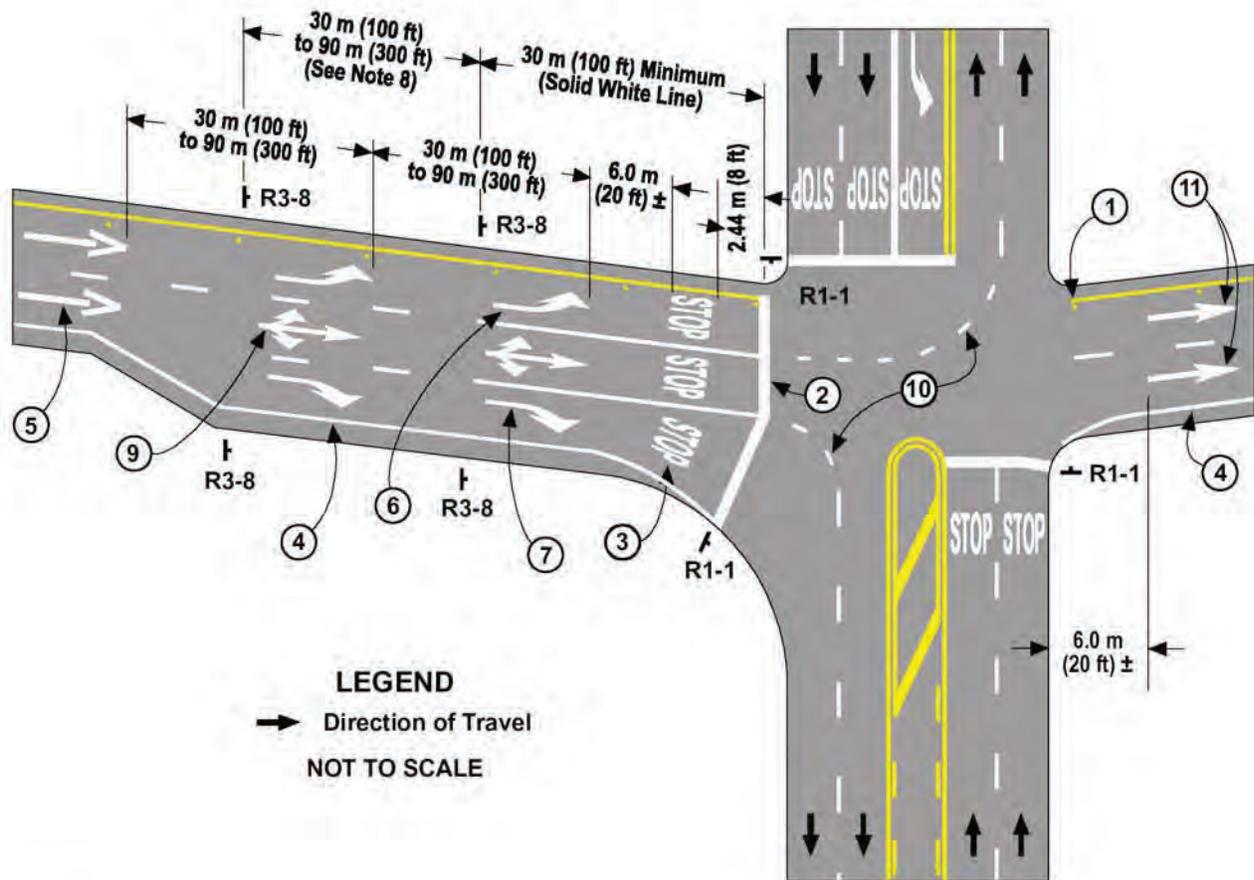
B-23 (CA). Examples of Entrance/Exit Ramp Terminal Signs and Pavement Markings (Sheet 5 of 6)
